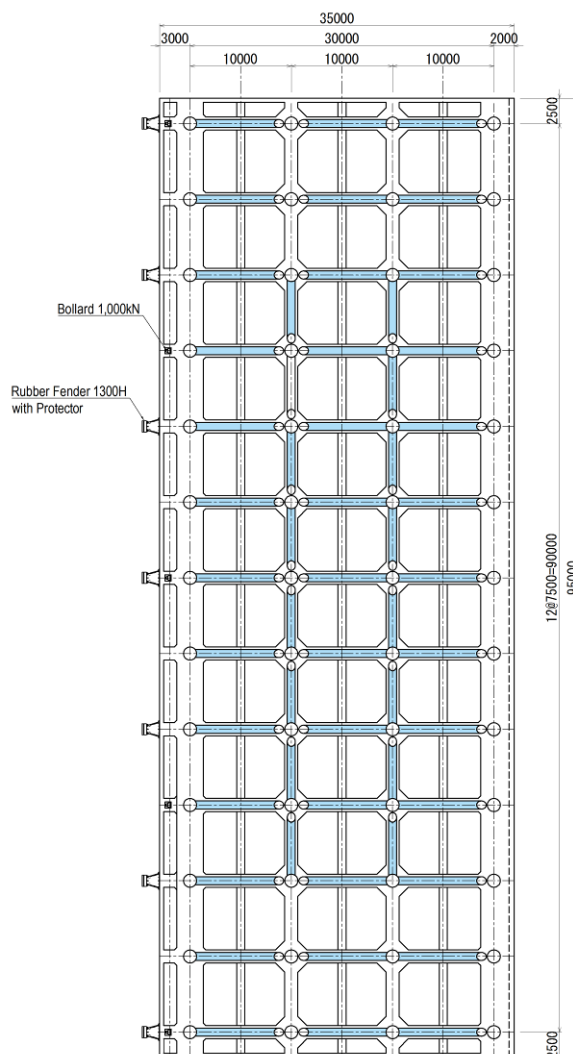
Layout Plan of Quay Piles, Struts and Ancillary (Fenders Mooting Bollards)
